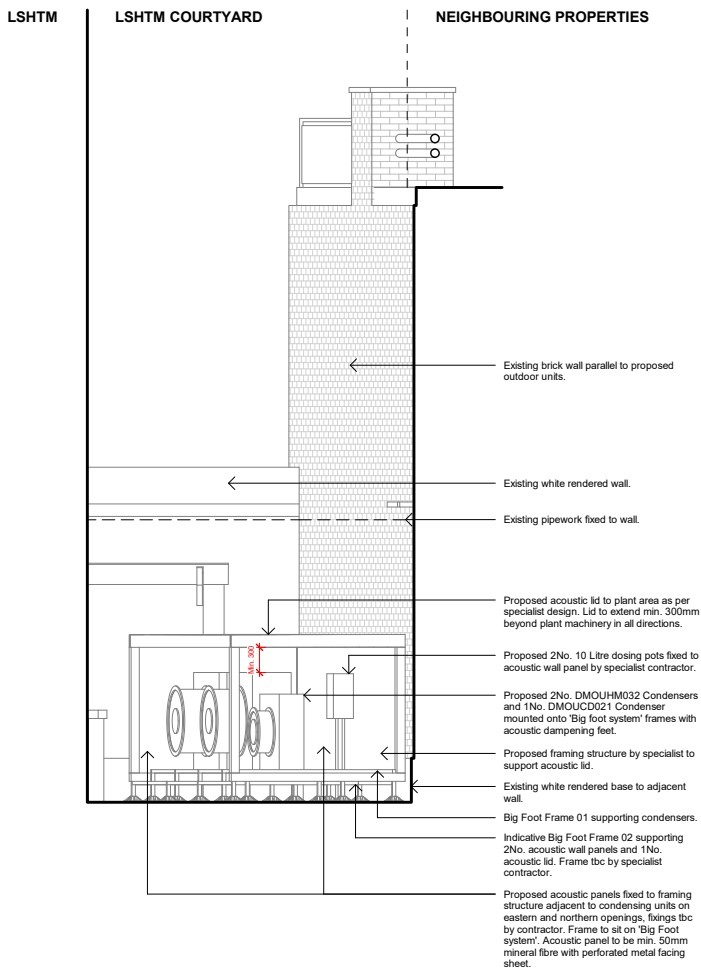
Elevation (not to scale) looking northwards from the eastern access/entrance toward the perimeter wall.
